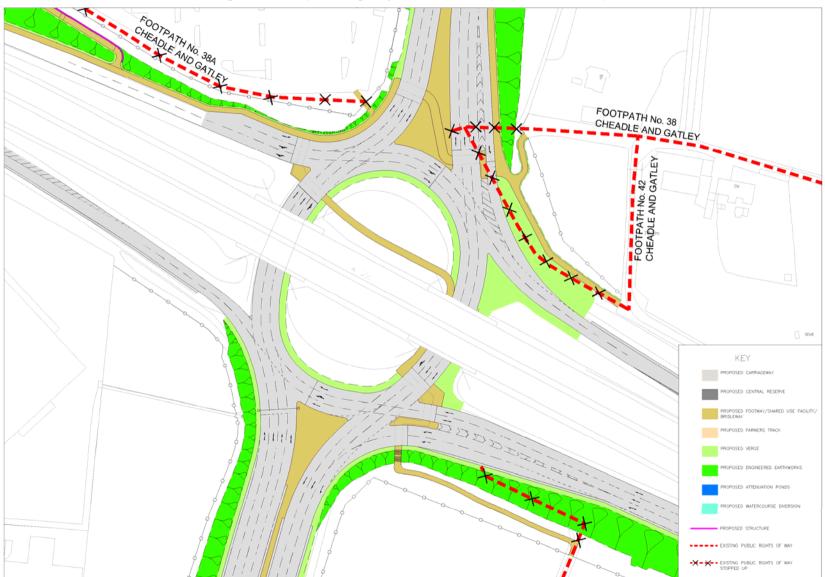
Proposed Highway Route: Cheadle (A34/ B5094 Stanley Road Junction)
